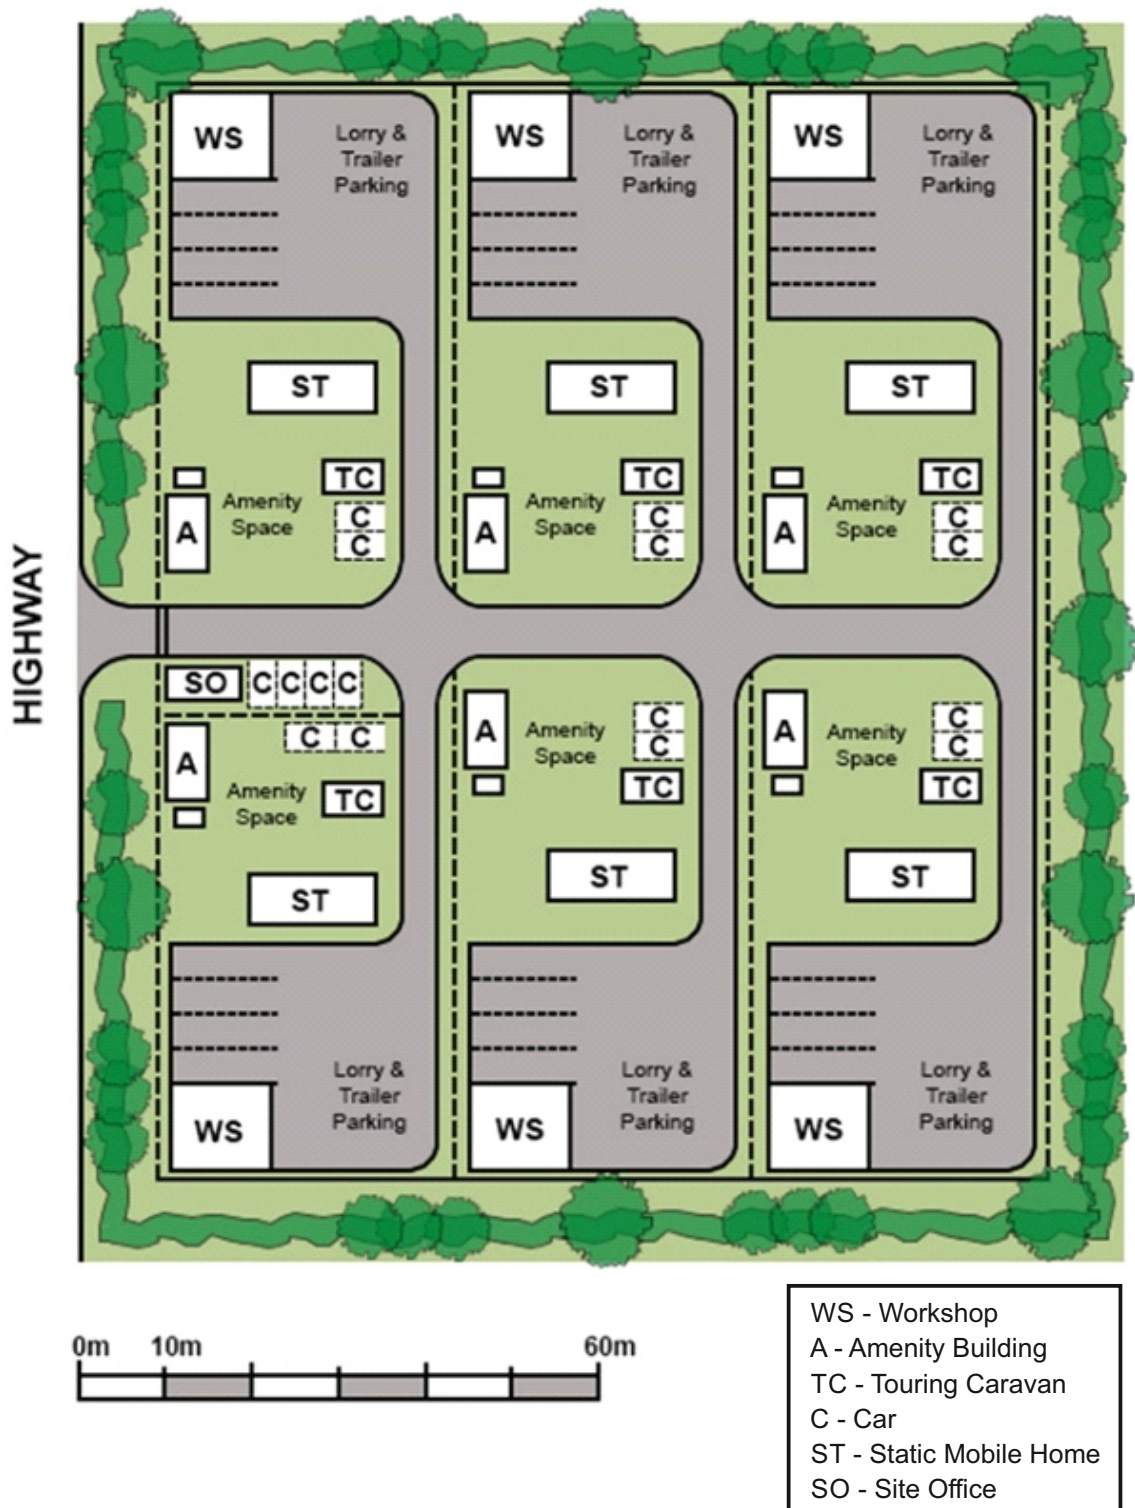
Indicative Travelling Showperson site example layout with shared provisions
